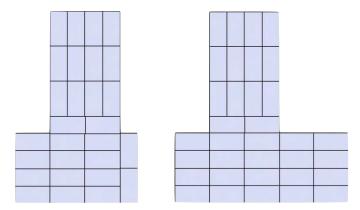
Plan A+A - 80,6 m² and plan A+B - 97,9 m².
